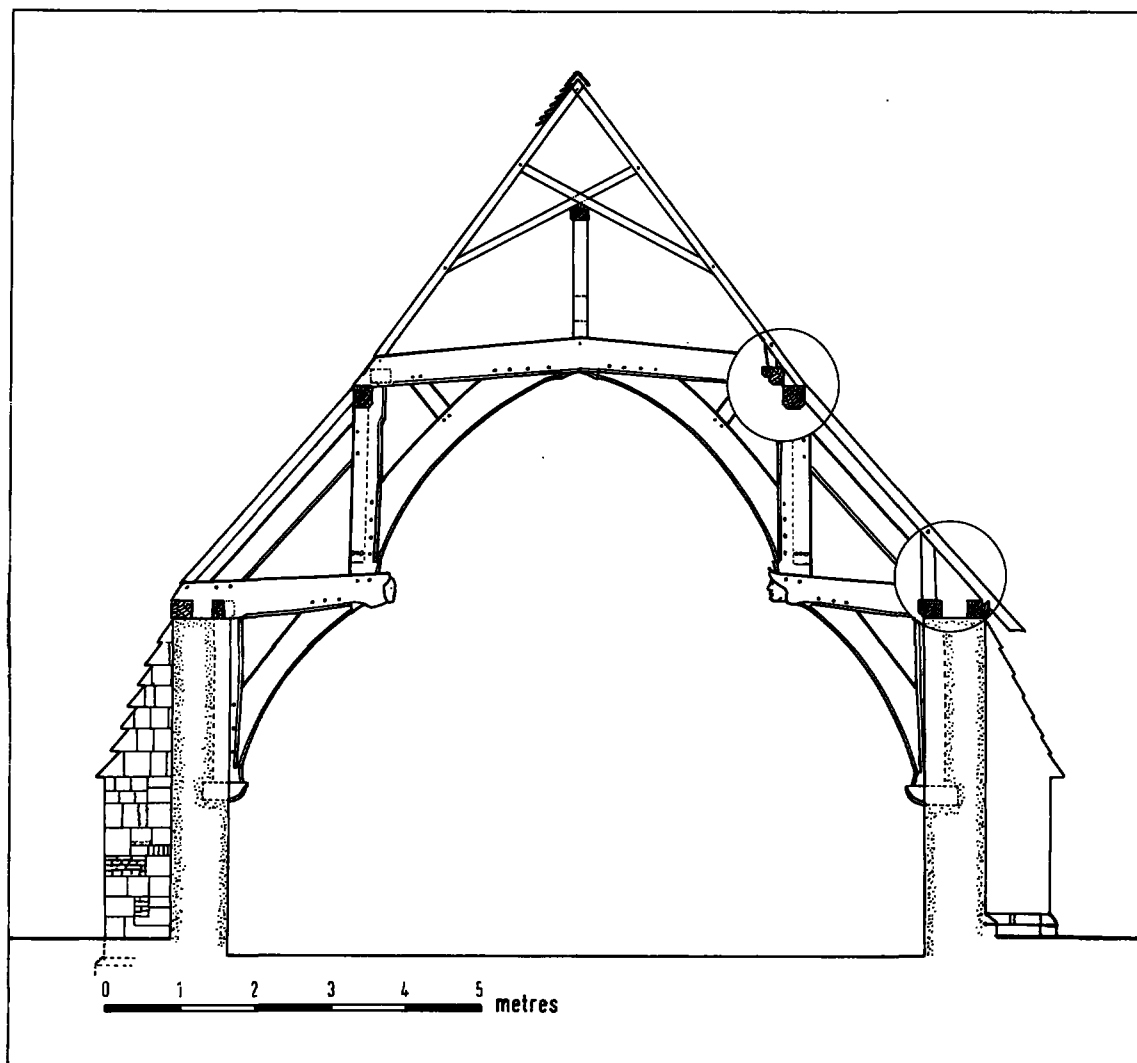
Pilgrims' Hall, Winchester. Elevation of hammer-beam truss. Scale 1:100.
